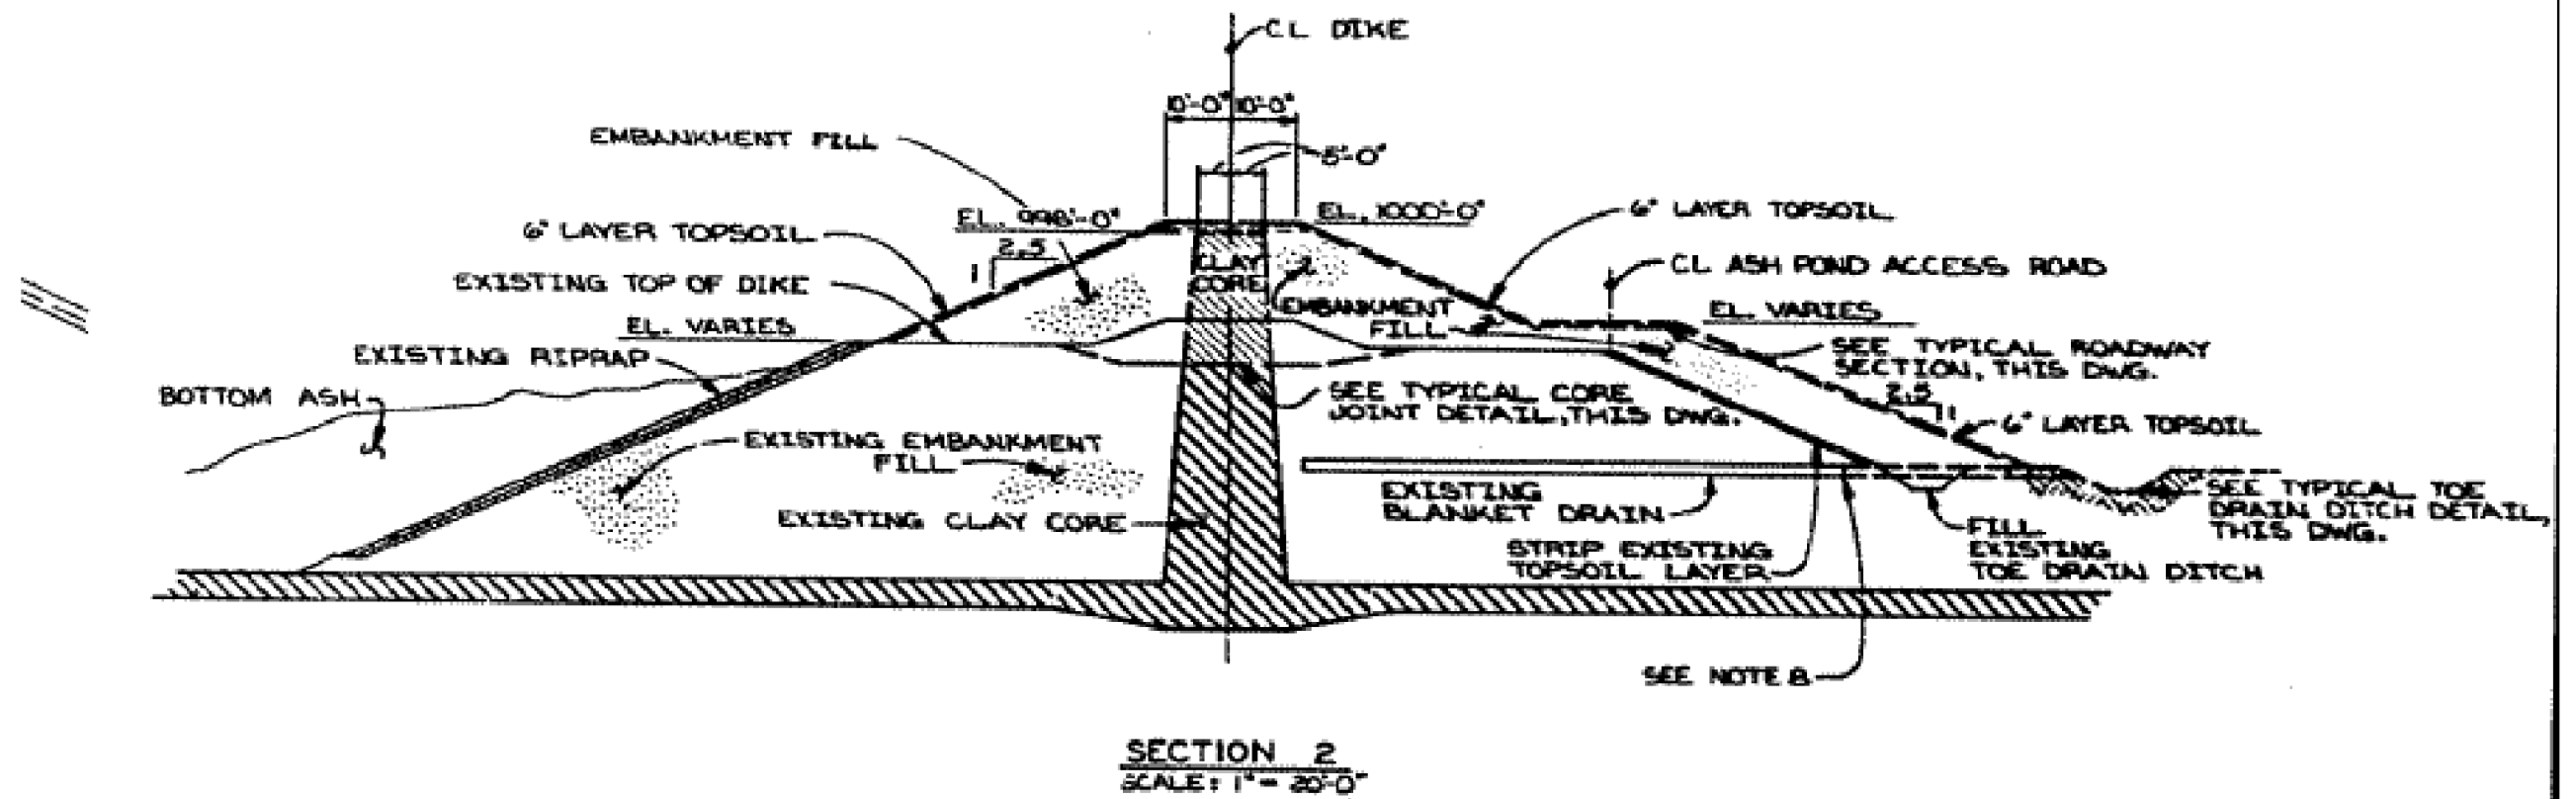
IMAGE REFERENCE: AS BUILT, REVISED DRAWING PER DWP SC-92-254, DWN: 3-6-95, PROJ: E91N055, BOTTOM ASH POND MODIFICATION PLAN, SECTIONS AND DETAILS
